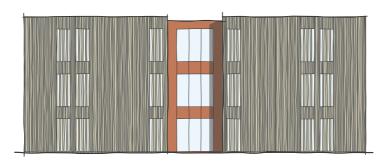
Accommodation Block Front Elevation (3 Storey)
